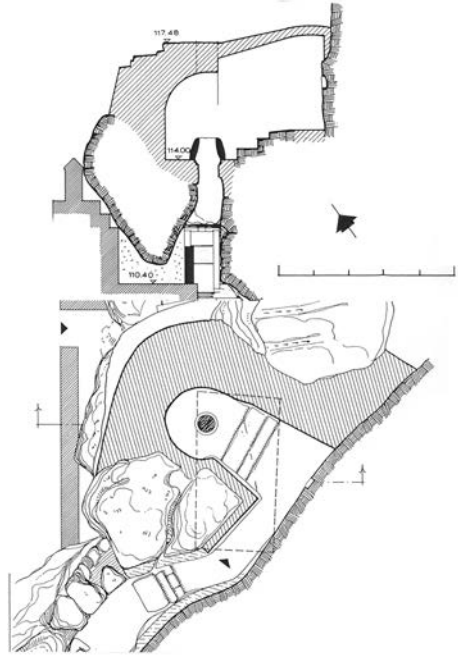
Hagioi Apostoloi 'sta marmara'. Plan and section. (A.W. Parsons, J. Travlos.)
